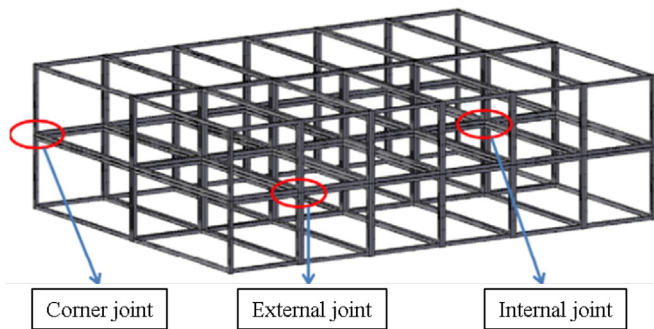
Modules connected by (a) corner joint, (b) external joint, and (c) internal joint.
